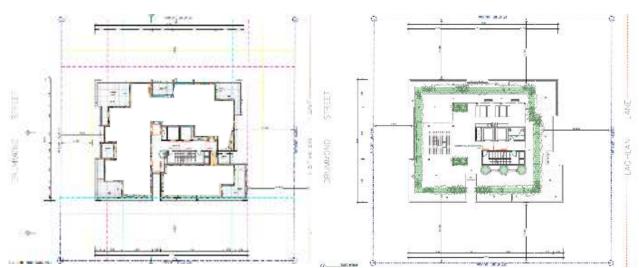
Demolition and Tree Removal Plan (Source: Zhinar Architects Pty. Ltd., Ref. 08632, Rev. C, dated 12/06/2020)
